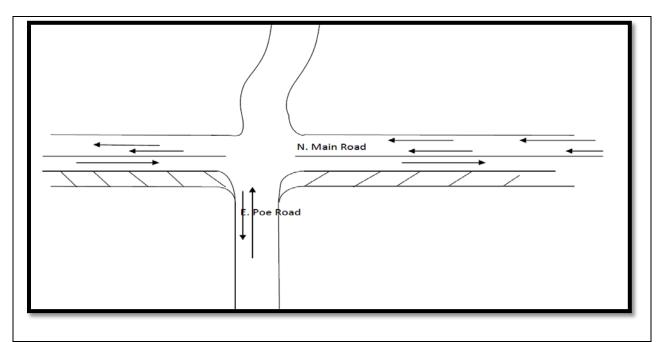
Typical traffic control plan 4 for pipe-bursting with one lane closed for traffic
